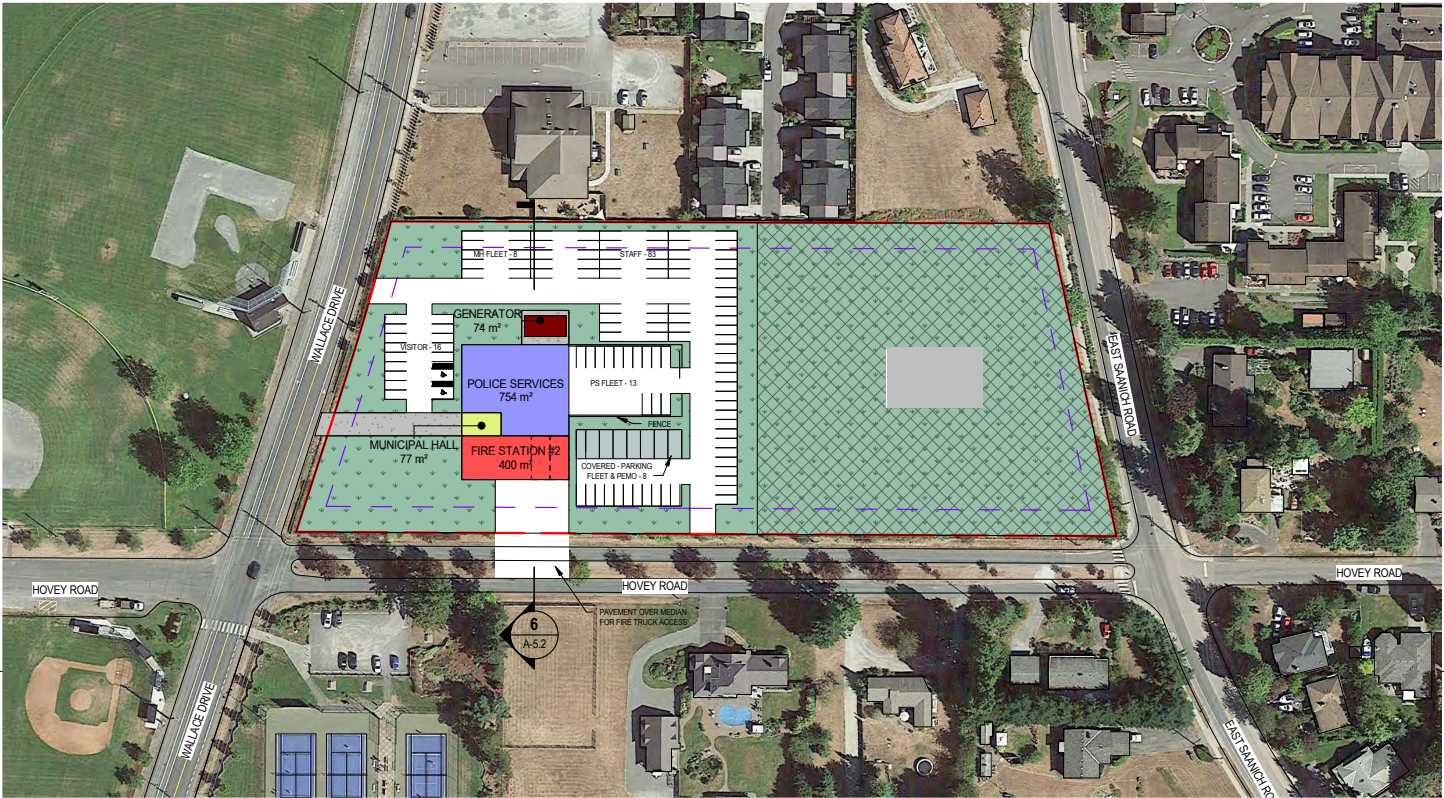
Hovey Road Site Concept: Site Distribution Concept 4
